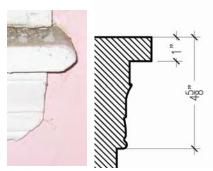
Window 104 sill type-2 photo and profile. (Photo: BBB, 2007)
